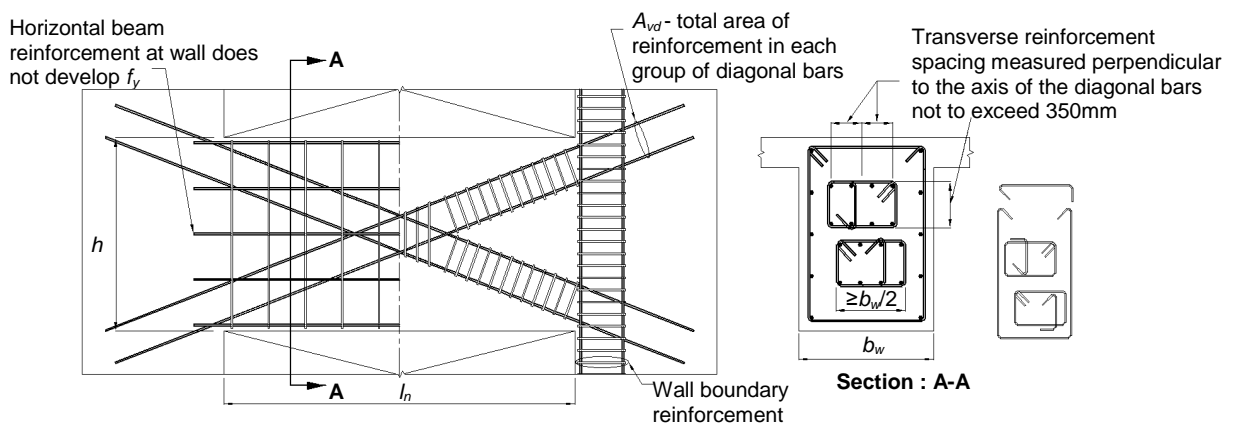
COUPLING BEAMS WITH DIAGONAL REINFORCEMENT
